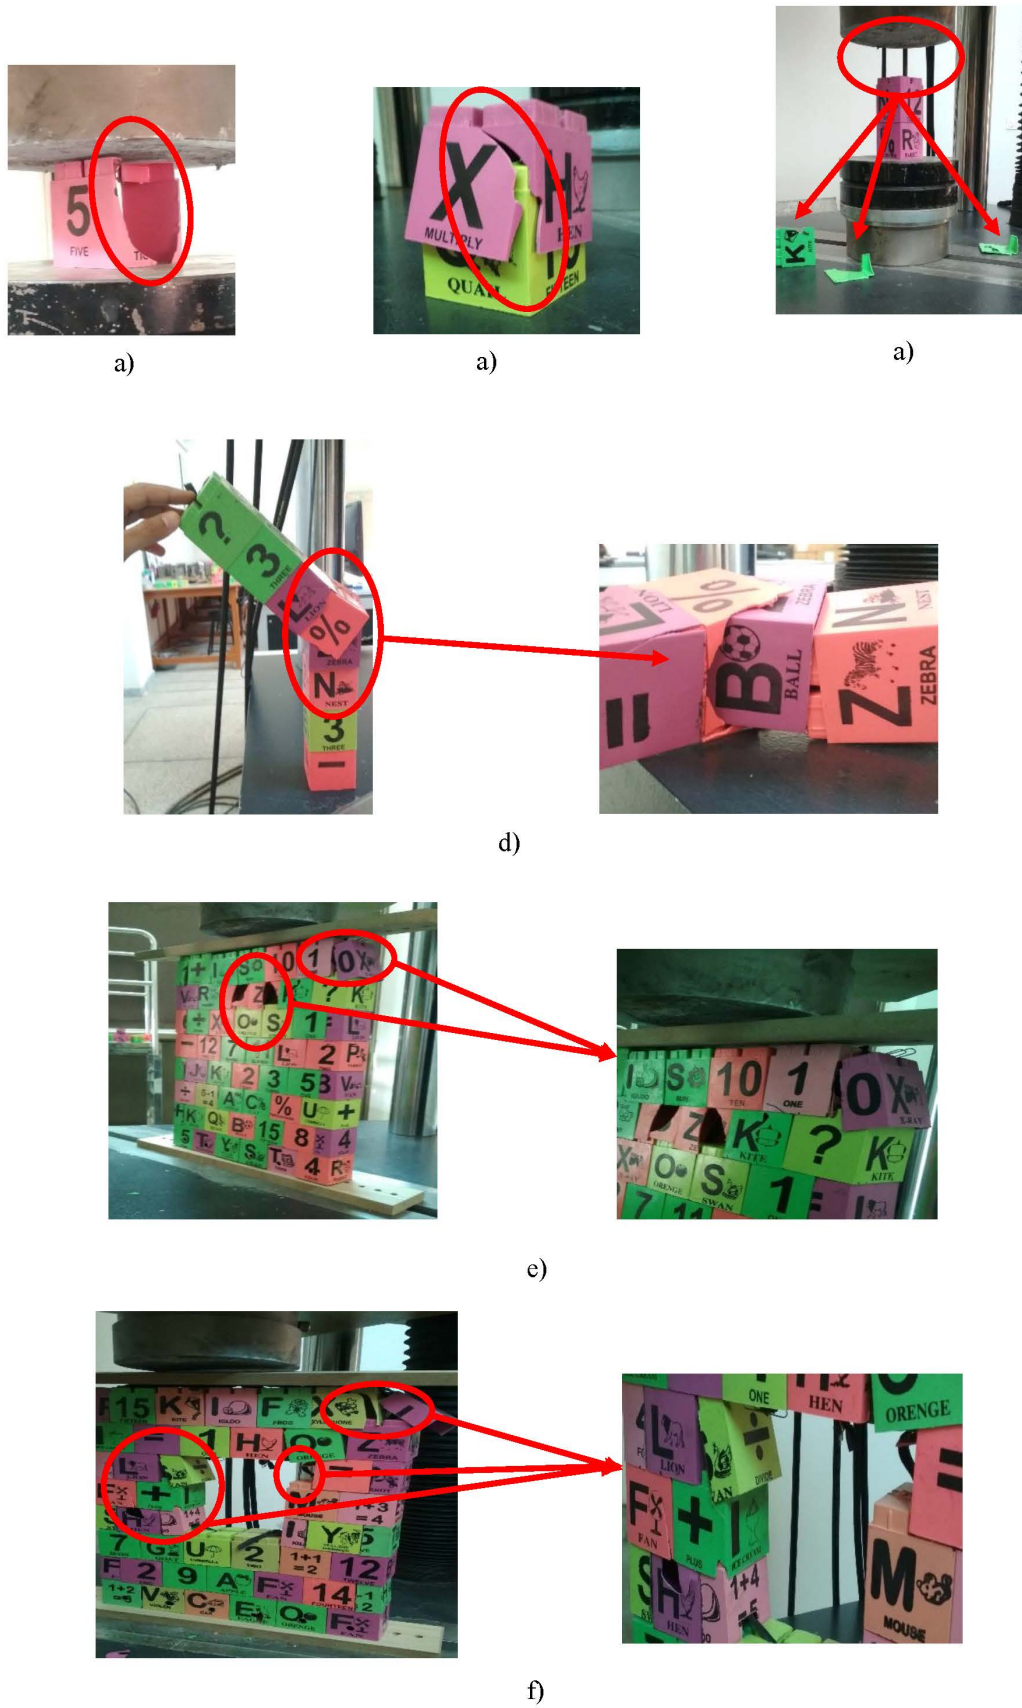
Crack pattern of interlocking plastic; a) one block b) two blocks c) three blocks d) column e) solid wall f) wall with opening.
